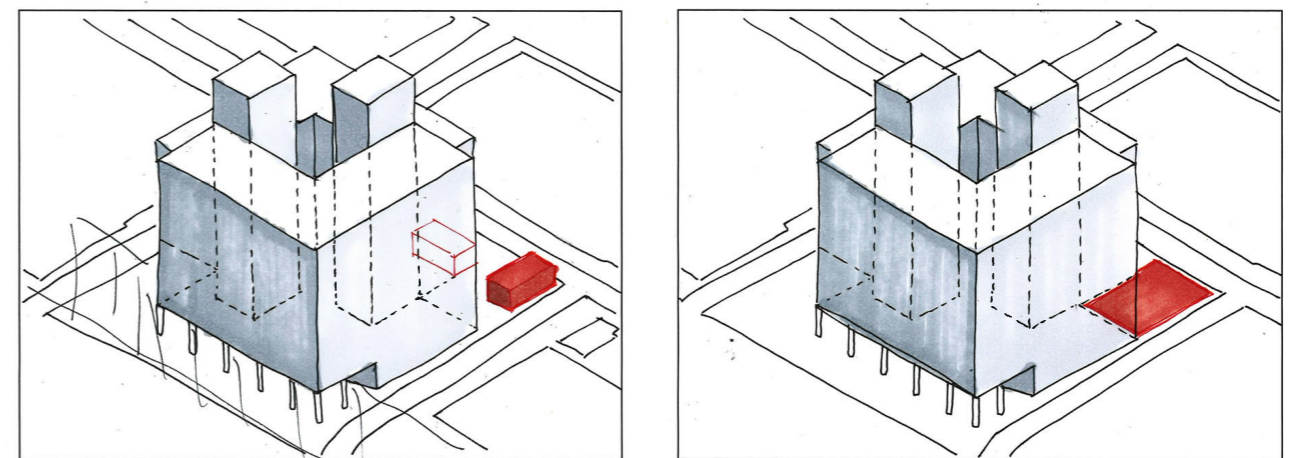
Surrounding interventions: relocating transformer building, removing parking spaces and adding terrace (Lars Haga, 2026)
